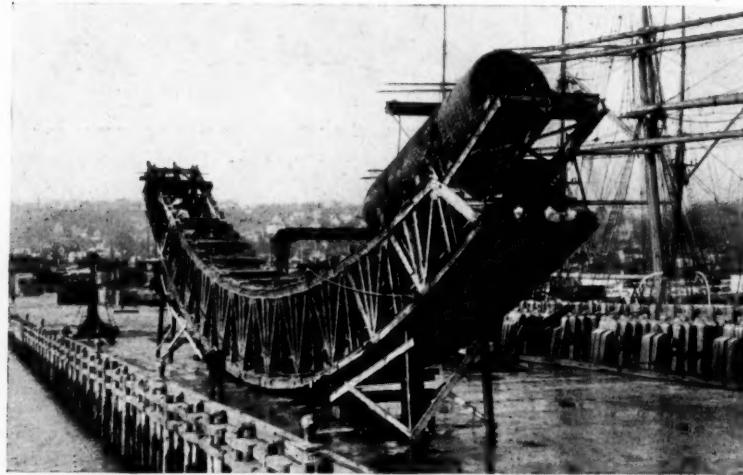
CRADLE WITH FLOAT AT LOWER END
